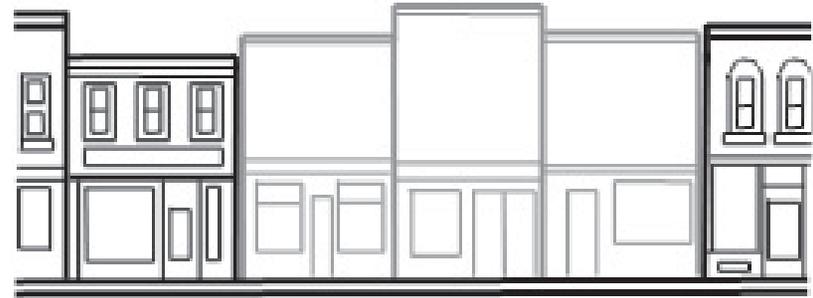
New buildings should be complementary to the established rooflines of neighboring buildings on the block
